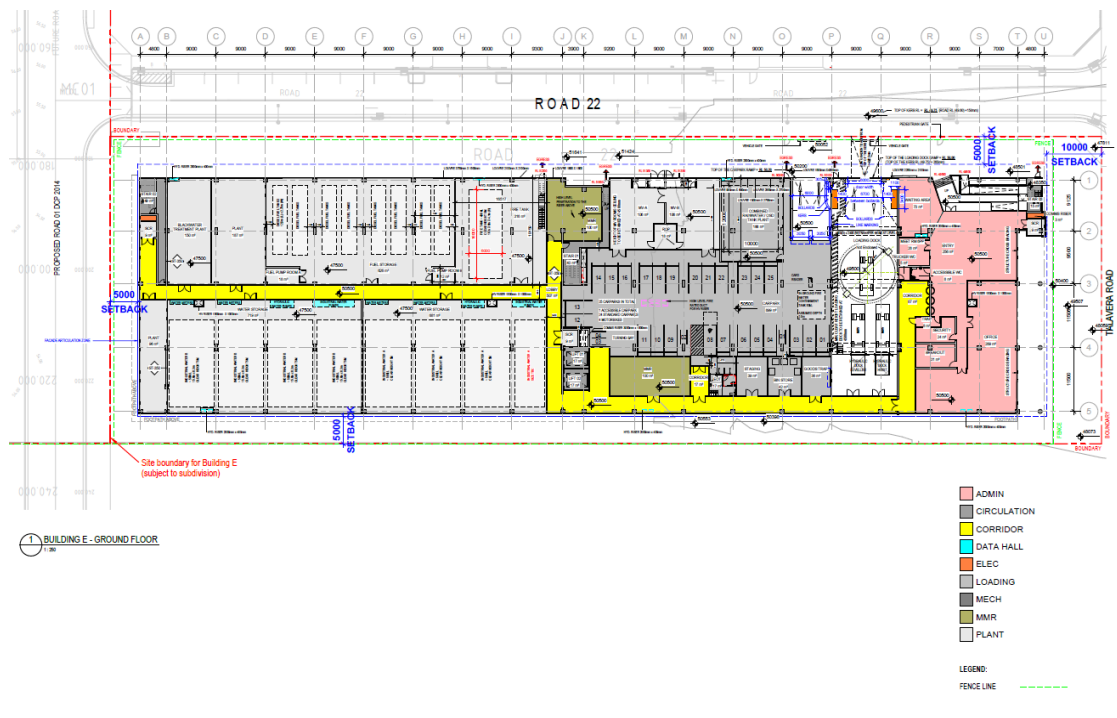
Ground floor Plan (Source: Greenbox Architecture)
